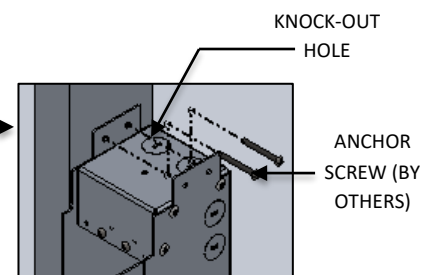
DETAIL SHOWING KNOCK-OUT HOLE AND SCREWS
